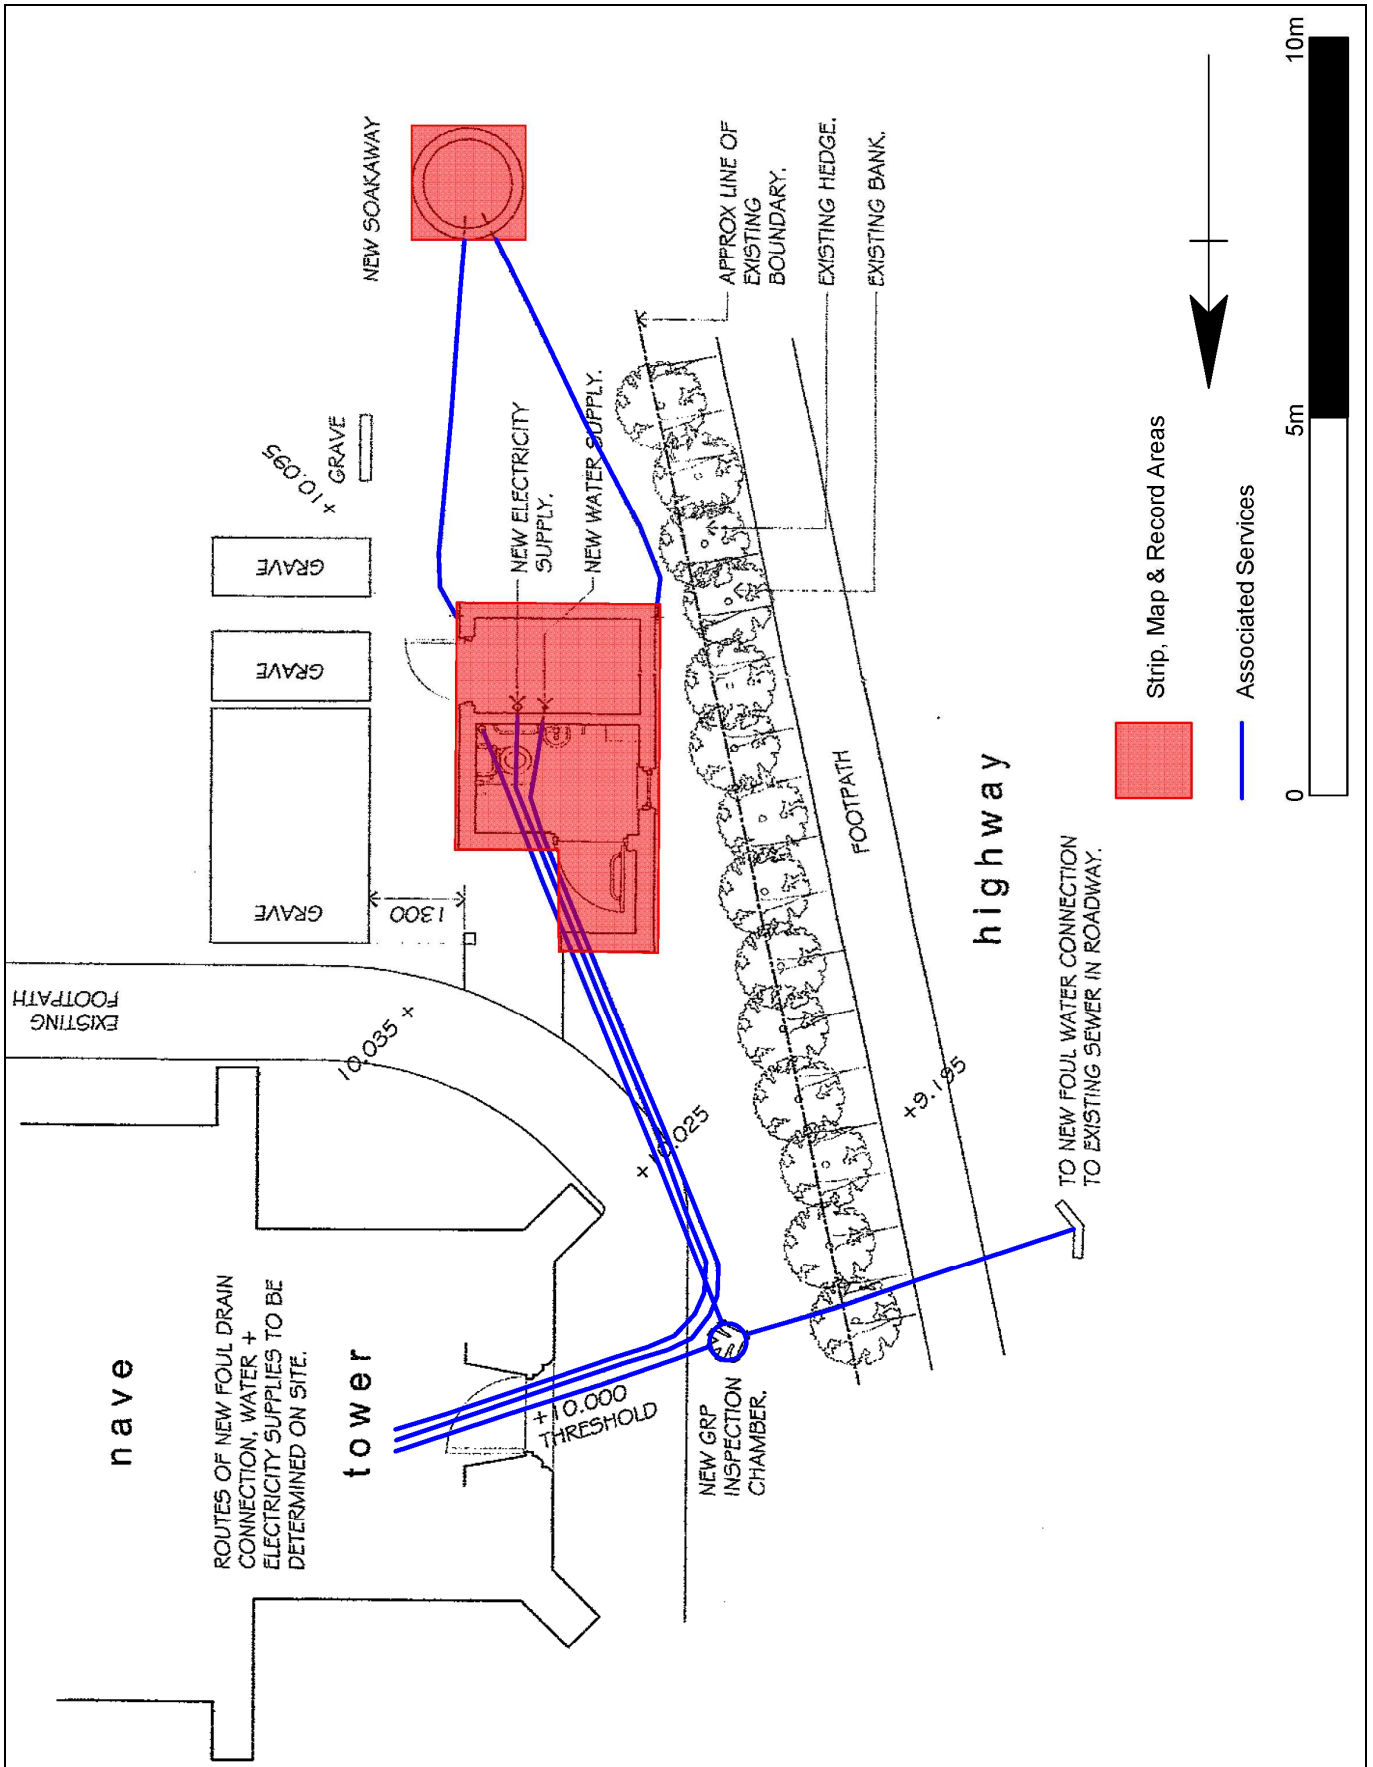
Proposed development and indicative excavation and watching brief area (scale 1:100)
